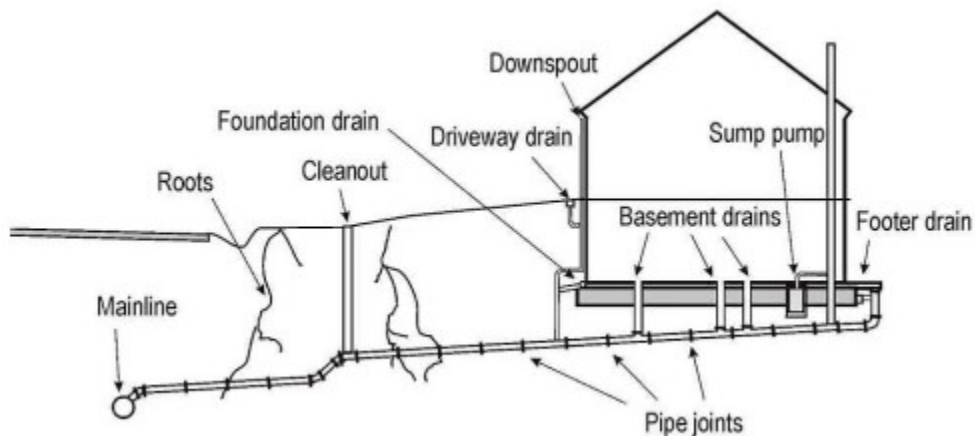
Typical layout of sewer laterals (Simicevic and Sterling, 2006b)
